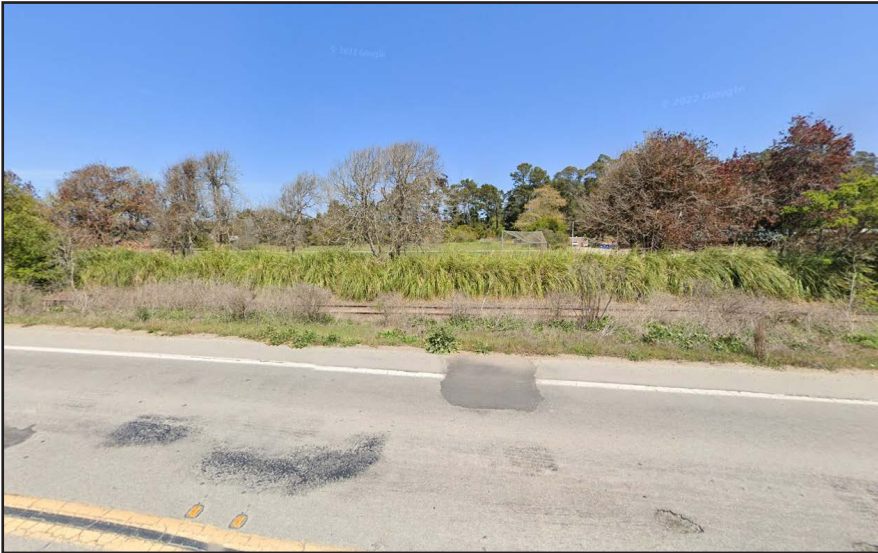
North facing view of the anticipated crossing location of the railroad and water distribution line on San Andreas Road.
